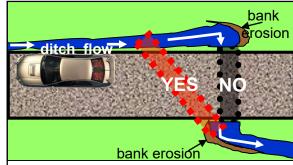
The crosspipe shown in black is improperly aligned straight across the road. The red pipe indicates a better pipe placement that will carry more water, cause less erosion, and will better resist crushing.
